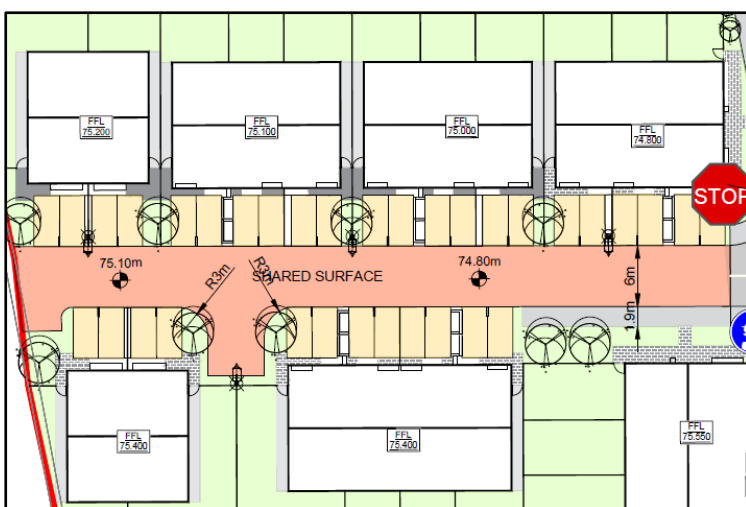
Proposed off street perpendicular parking accessed from shared surface in the west of the development (Source: ORS Drawing 241139-ORS-ZZ-00-DR-TR-700)
